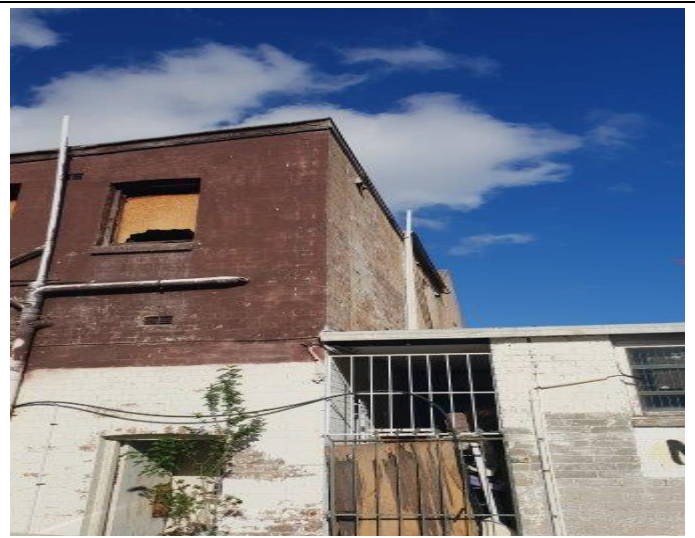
38 Good Street, Western façade timber framing, lead containing maroon paint (WSP-104460).
